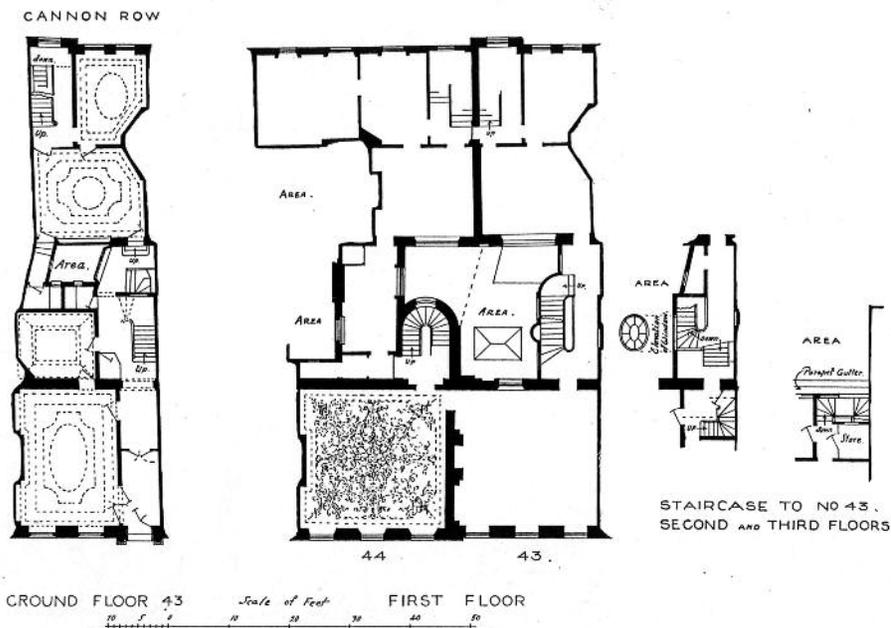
Nos. 43 Parliament Street, plan of ground floor and first floors of No. 43 & 44 (*Survey of London*, X, pl. 2).
